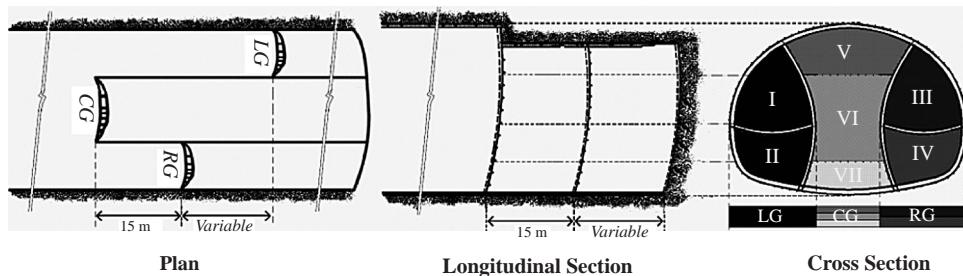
Plan view, longitudinal and transverse sections with variable distance between faces of side drifts.
